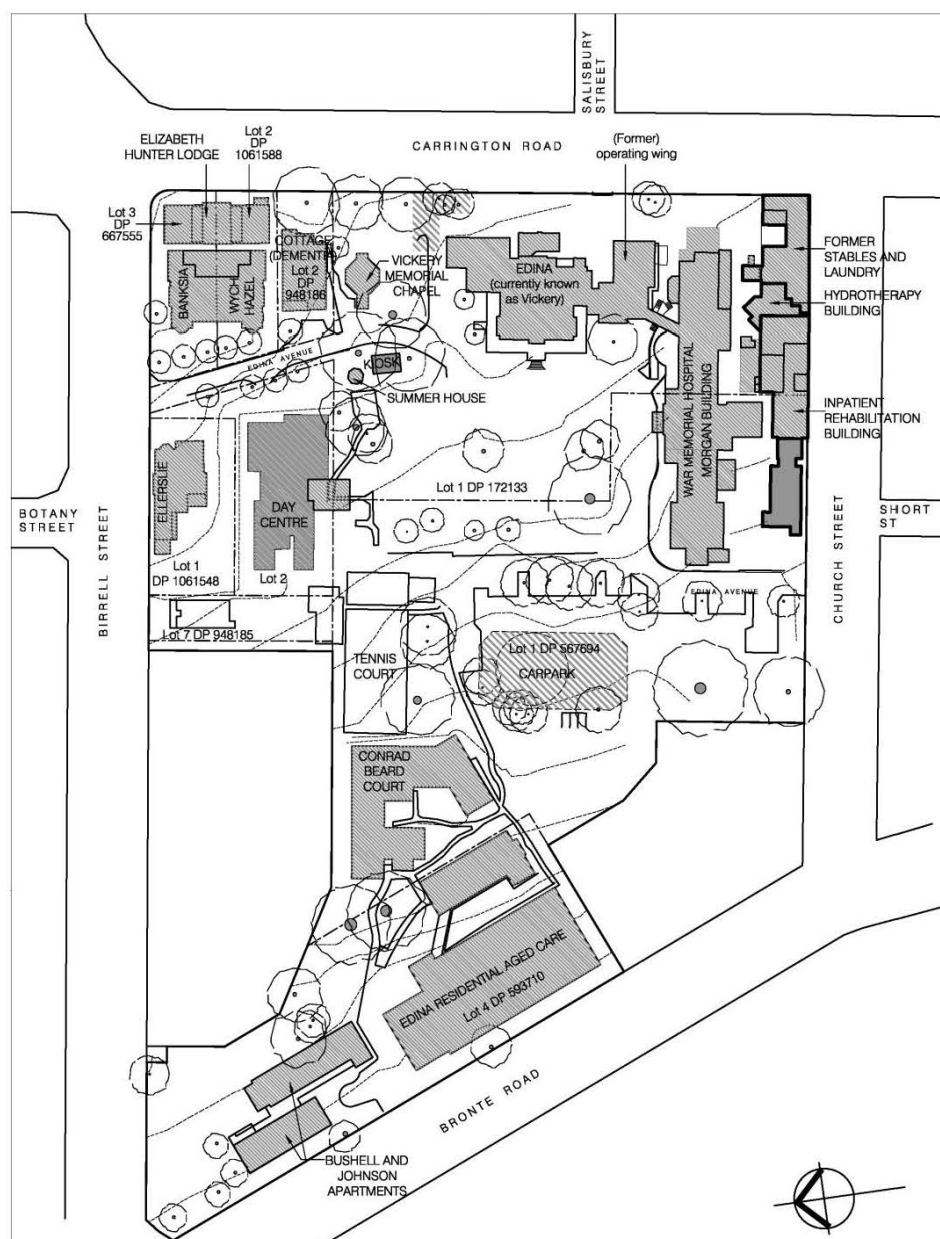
Site Location Plan for Uniting Waverley War Memorial Hospital Site. (Source: Hector Abrahams Architects.)
